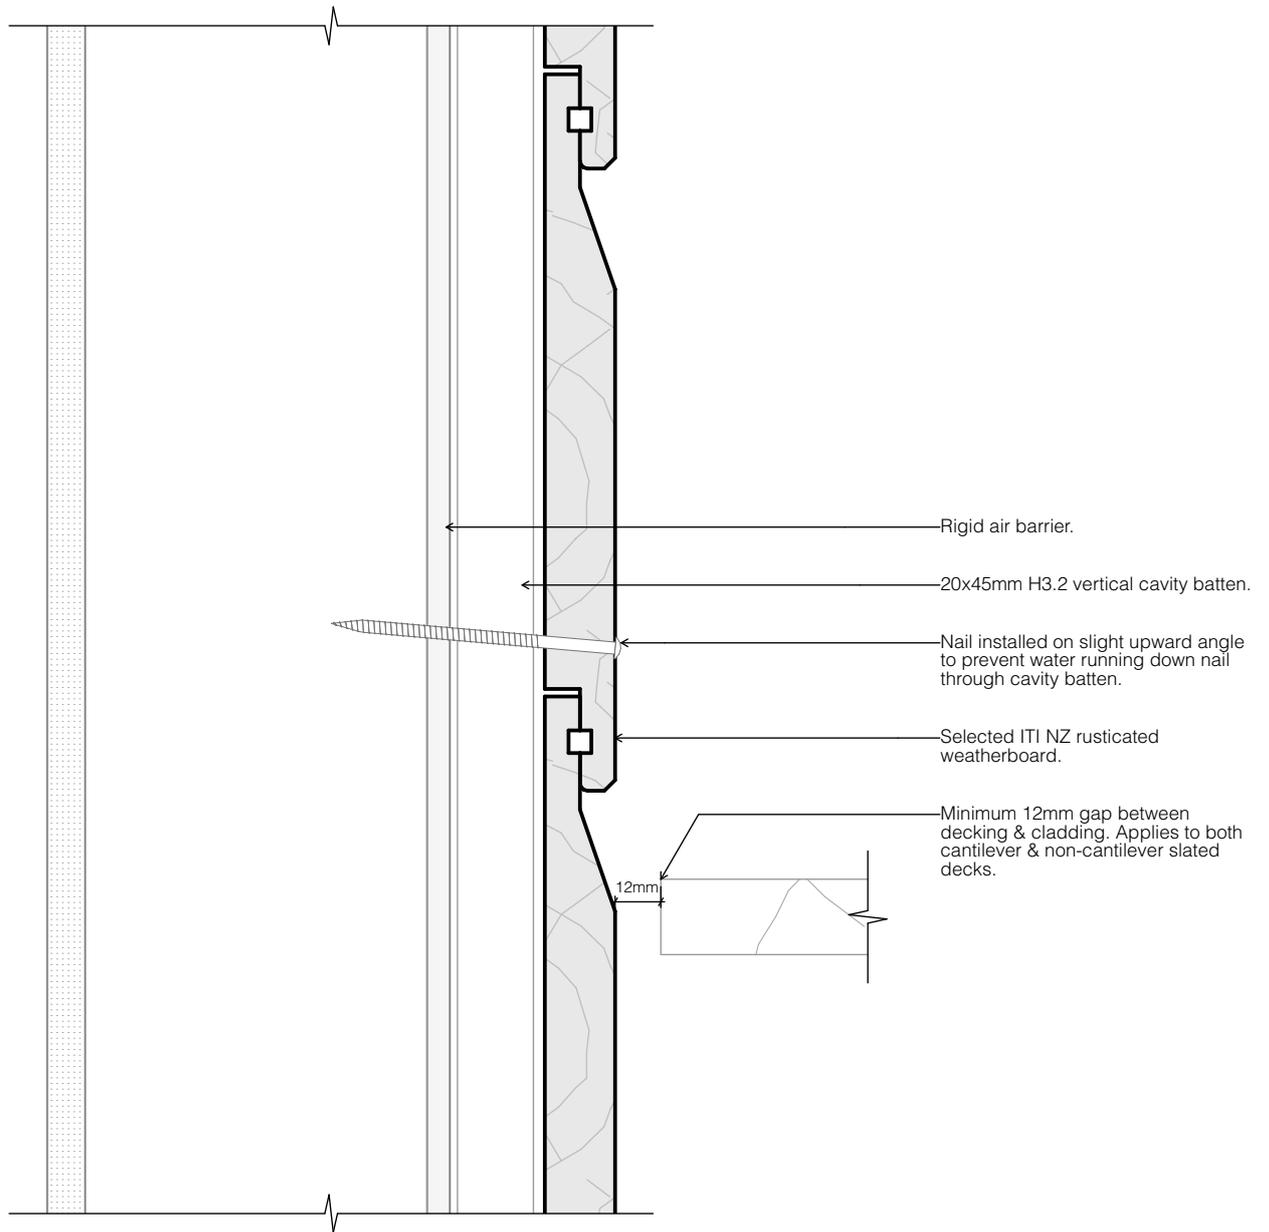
602 BASE – TIMBER FLOOR
